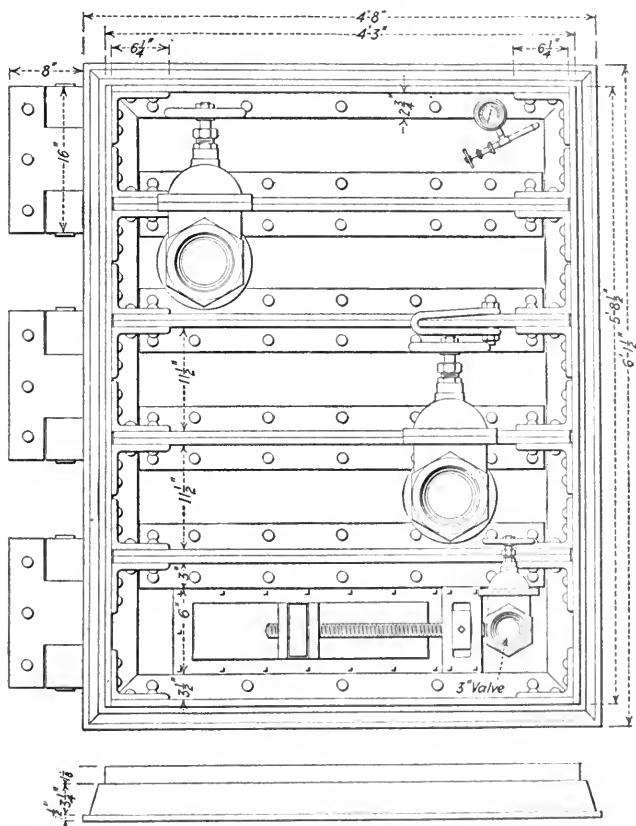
CONSTRUCTION OF DOOR AND ARRANGEMENT OF VALVES.
